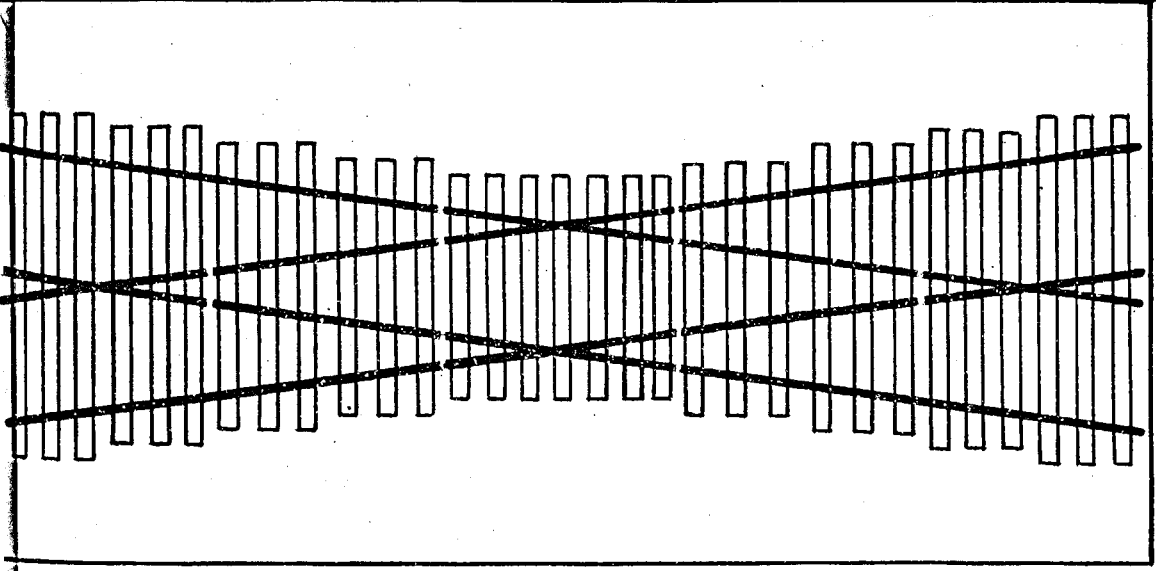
TIMBERING OF DIAMOND LAYOUTS
